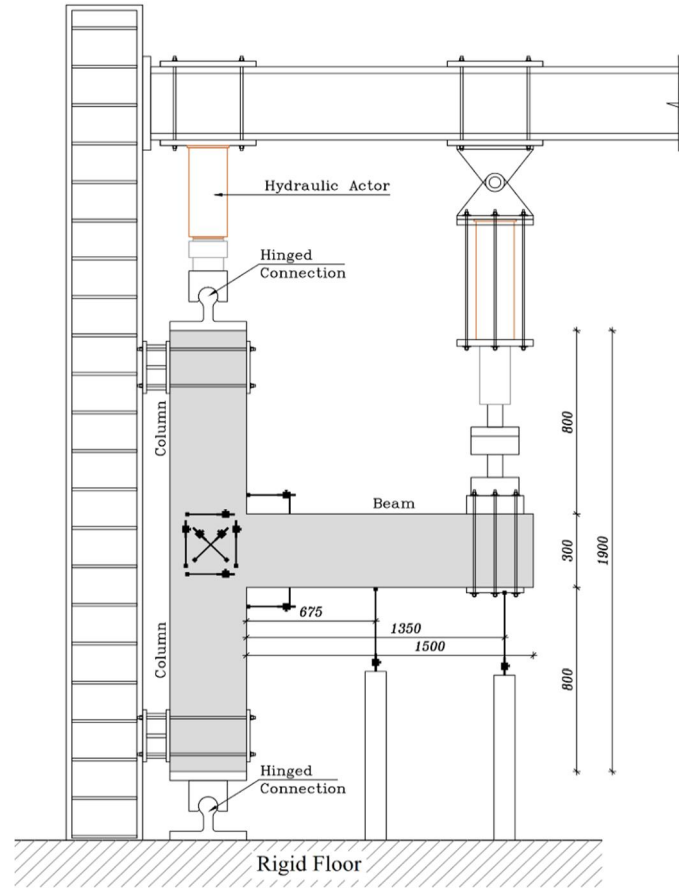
Overview of test setup and instrumentation (dimensions in mm)
